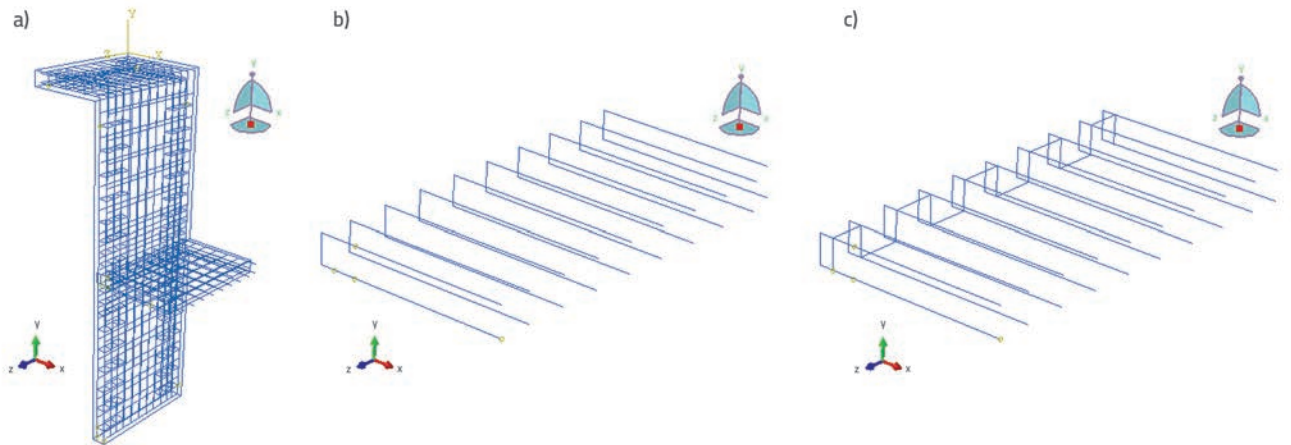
Connection specimen models: a) subassembly model; b) type 1 joint modelling; c) type 2 joint modelling
